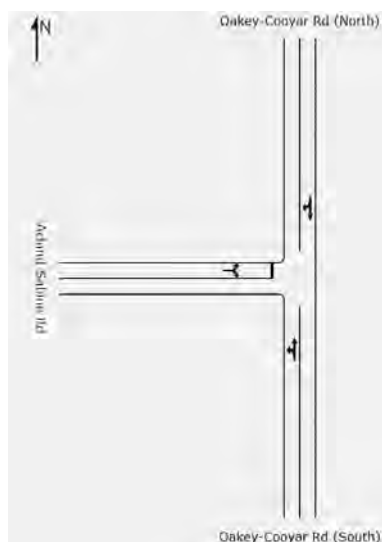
E: Existing intersection Layout –Acland Sabine Road/ Oakey –Cooyar Road
